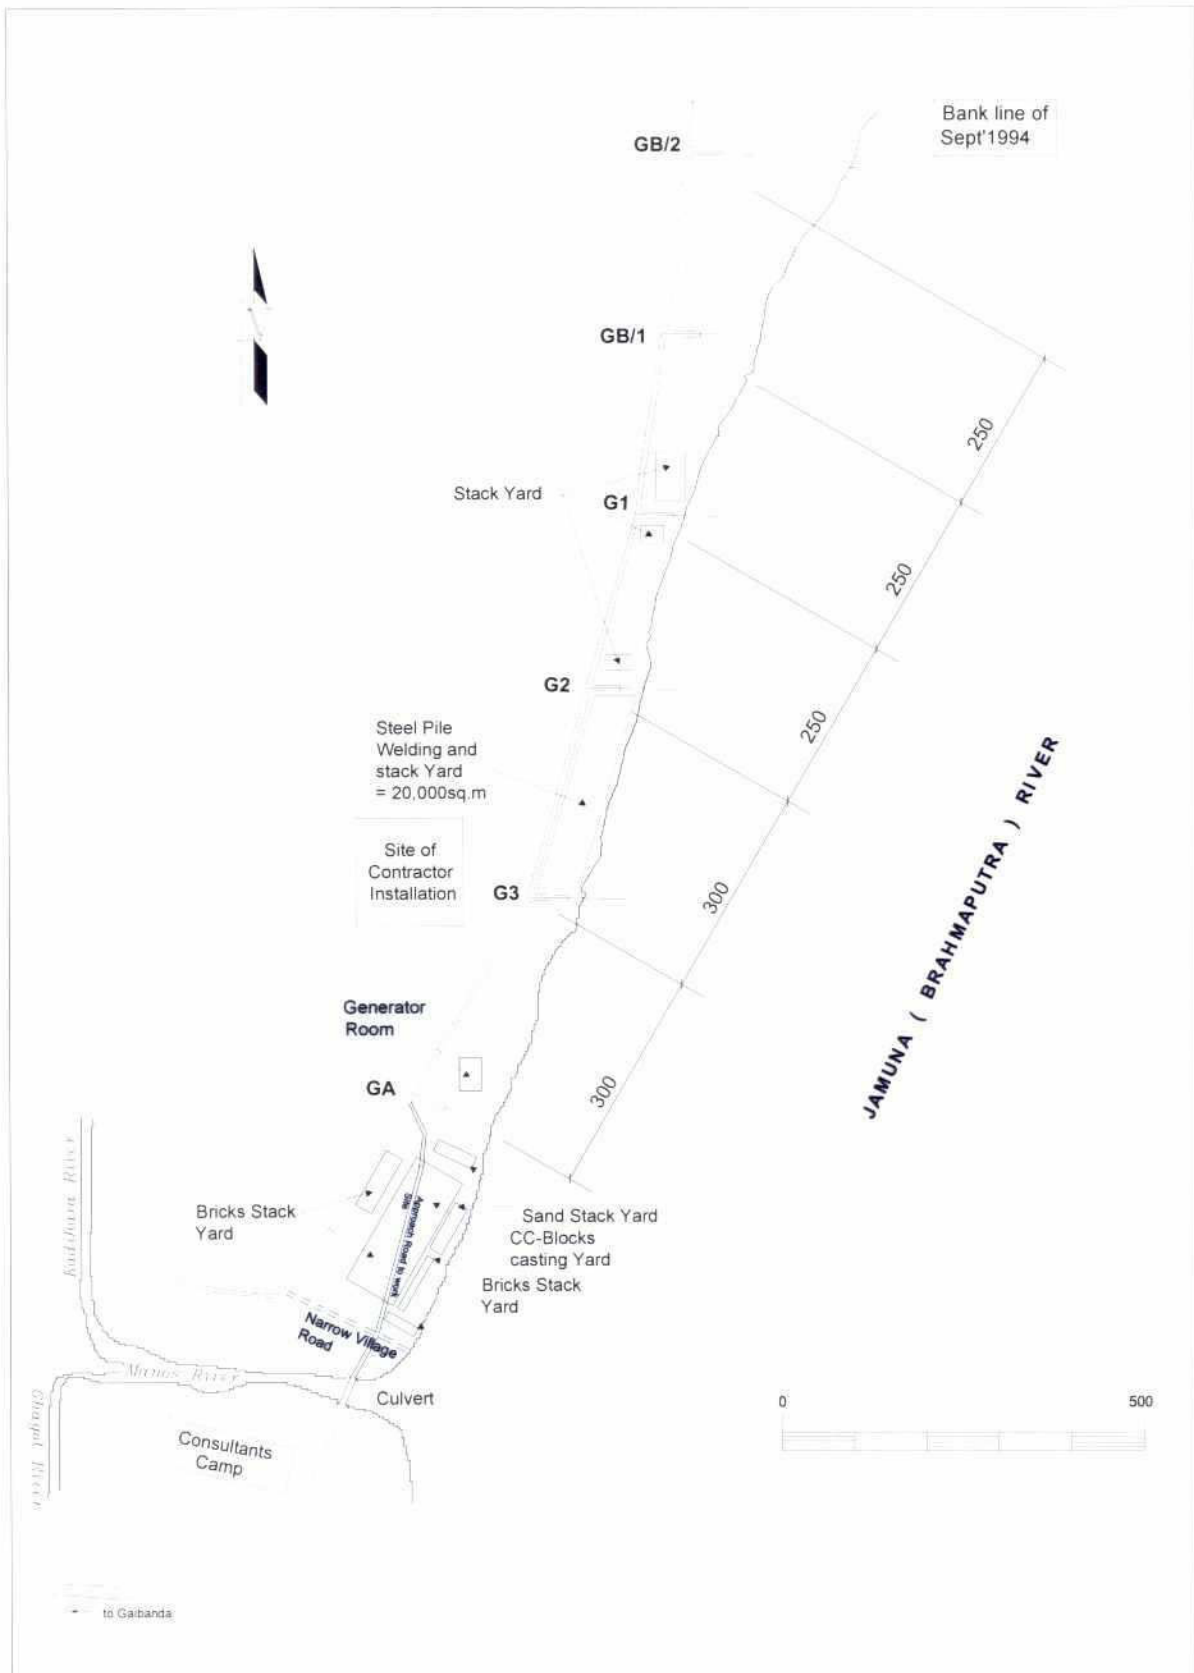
General Layout of Site Installation – Test Site I (Kamarjani)
